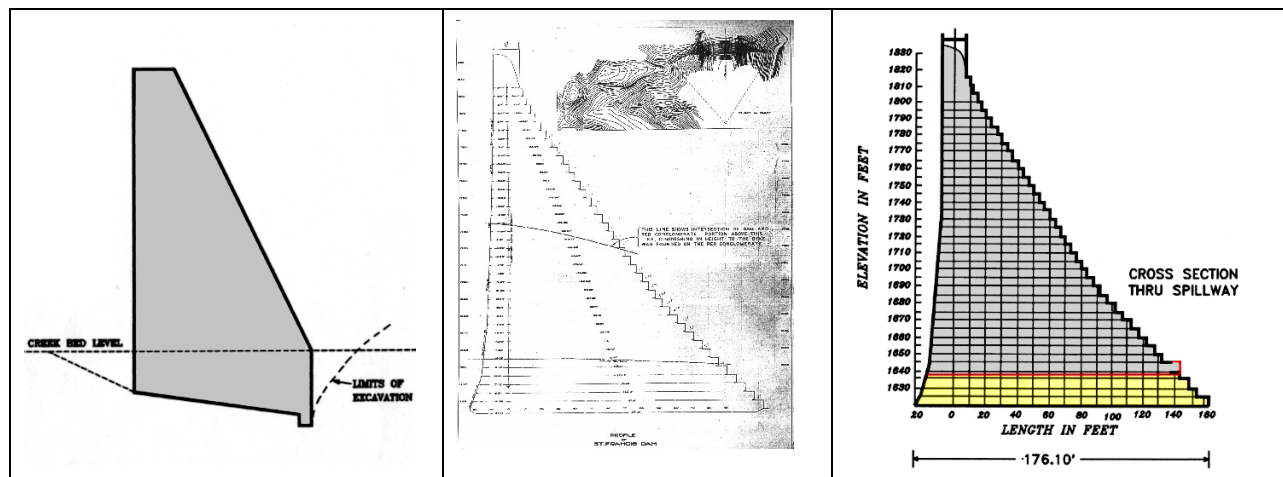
Left pane shows the original maximum section through the St Francis Dam, made in July 1923. Middle pane shows the as-built drawing released by BWWS after the failure, showing a flared toe, up to 175 ft wide at elevation 1625. The right pane shows the actual limits of the dam in red, with a base width of 148 ft.
